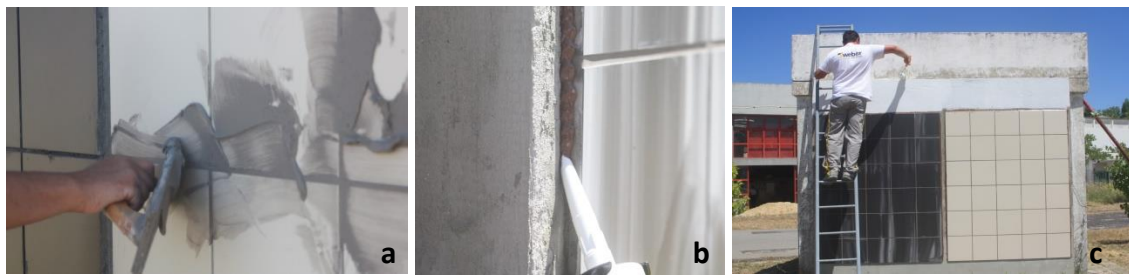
Joints' closing (a), edges' sealing (b) and top waterproofing (c)
